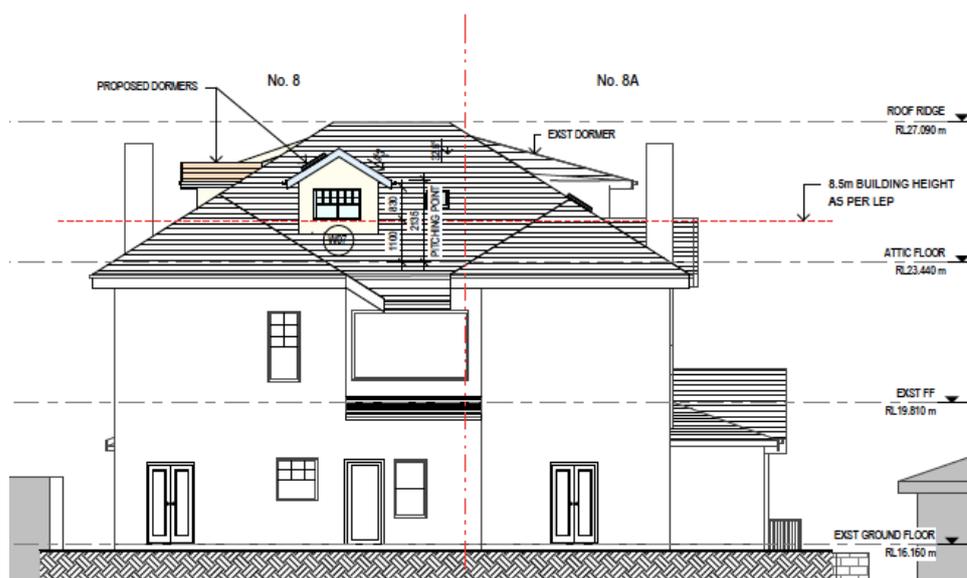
extract of western elevation showing the extent of the dormer when viewed from the rear. When compared to the original plans, the bulk and scale of the roof addition has been reduced in this area.
